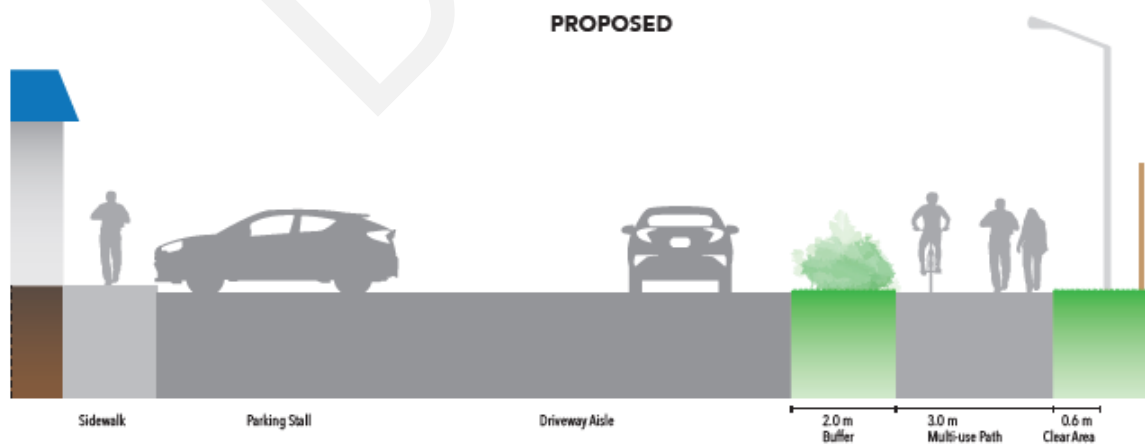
Proposed Pathway Cross-section when Adjacent to the Parking Lot
